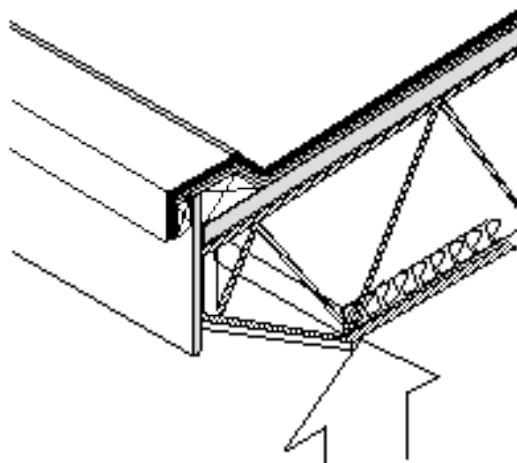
Metal trim at eaves of a mastic asphalt cold roof
